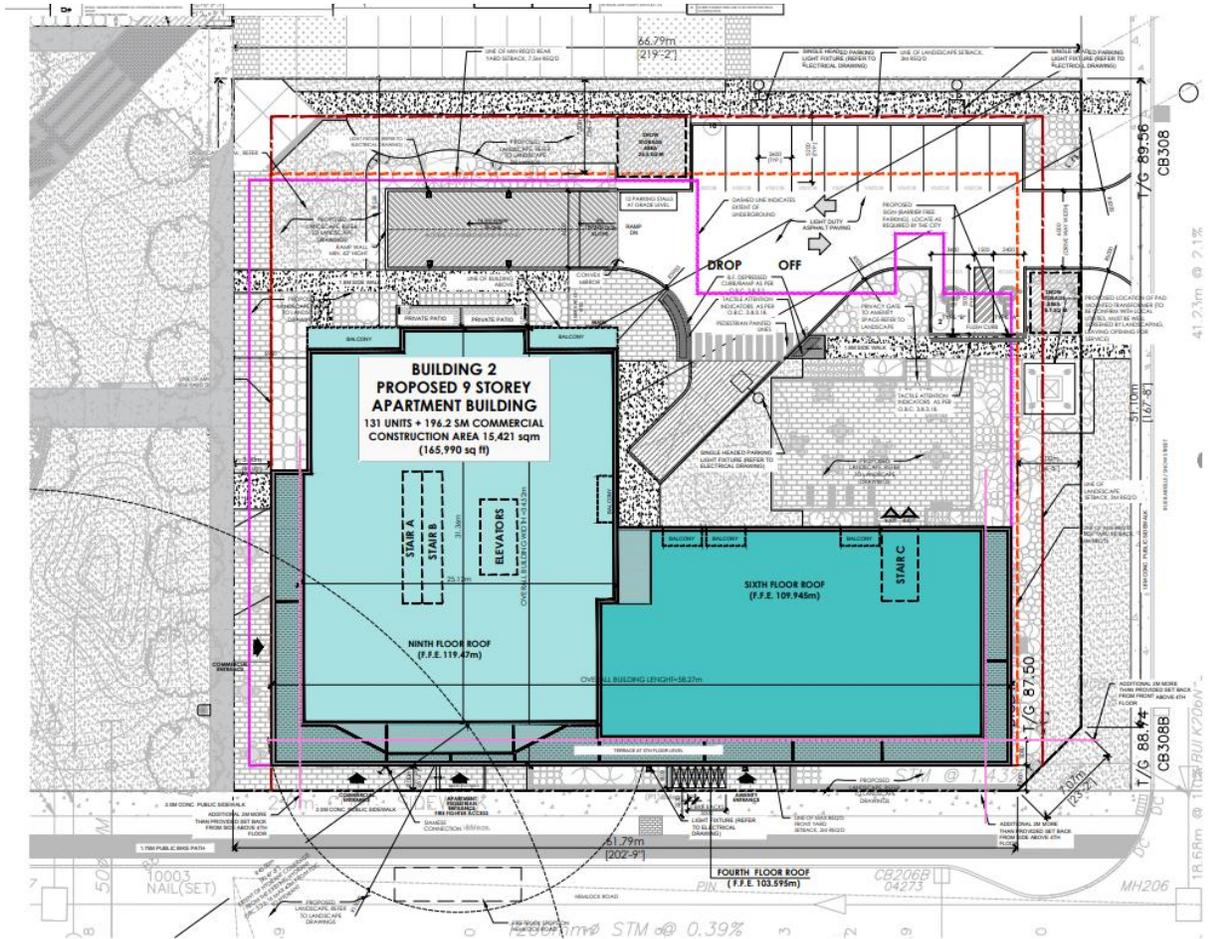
Building 2 (1345 Hemlock Road) Site Plan
